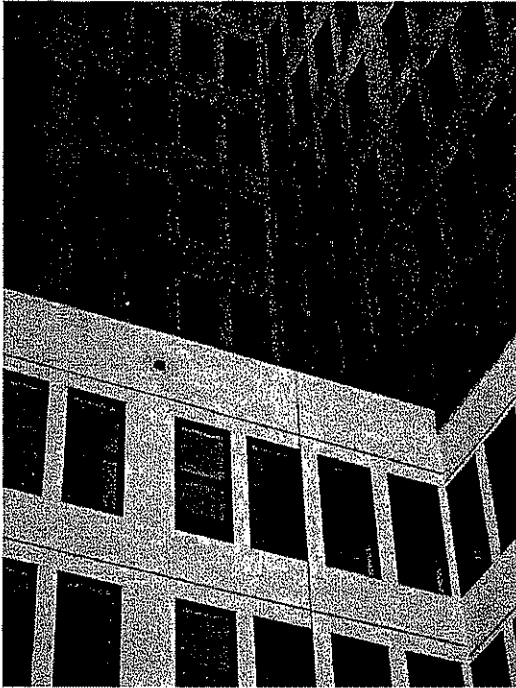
Exterior of new units constructed as infill within light well area. Floors 2,3,4,5. This additional space allowed for functional units on these floors. All sides were stuccoed for consistency of appearance. New windows are of similar form and design to similar windows in stories above.
